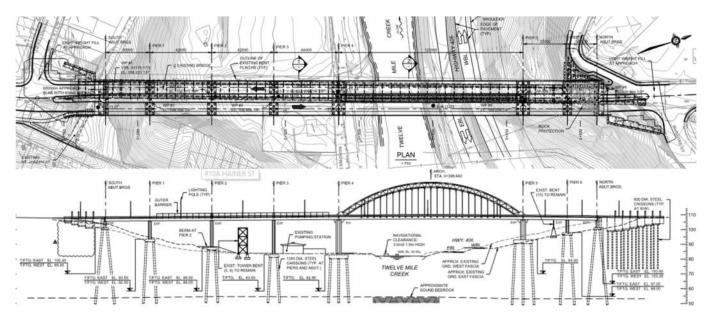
Burgoyne Bridge Plan and Elevation
